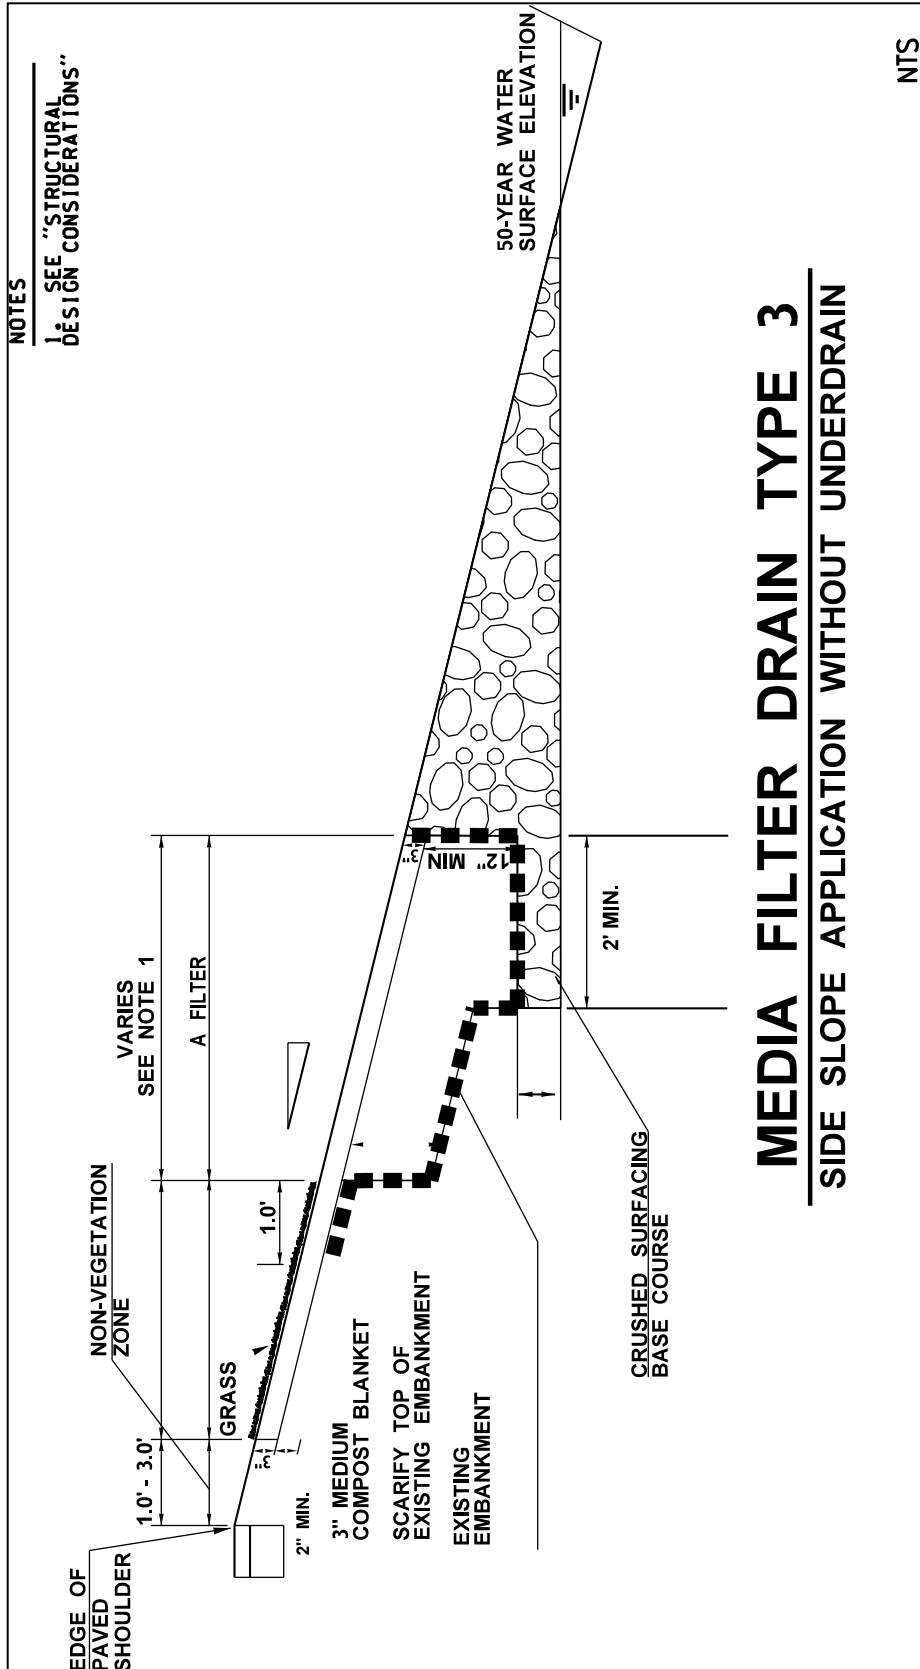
Media filter drain Type 3: Side slope application without underdrain.
